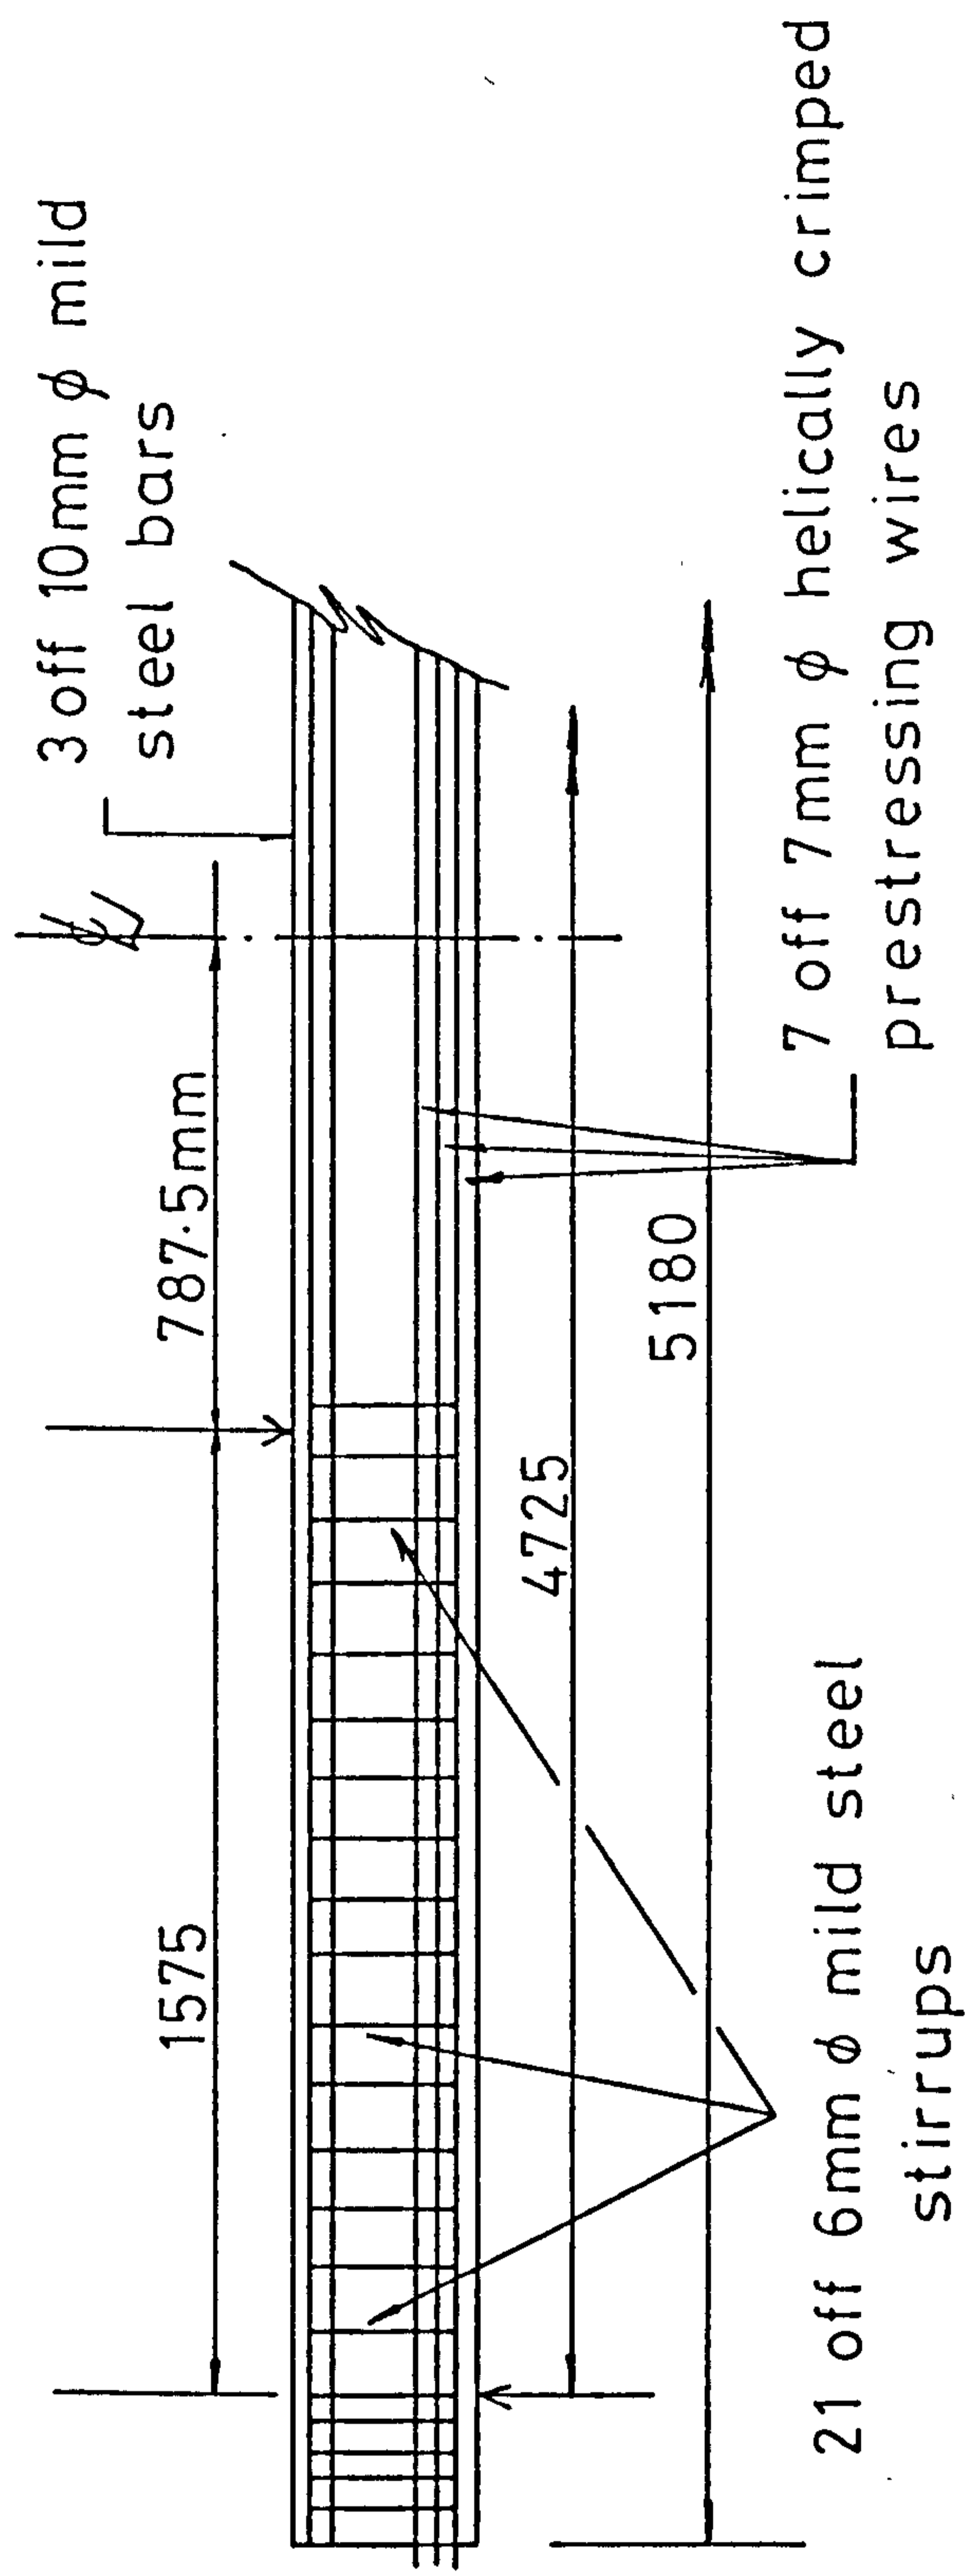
T BEAM LONGITUDINAL SECTION -
